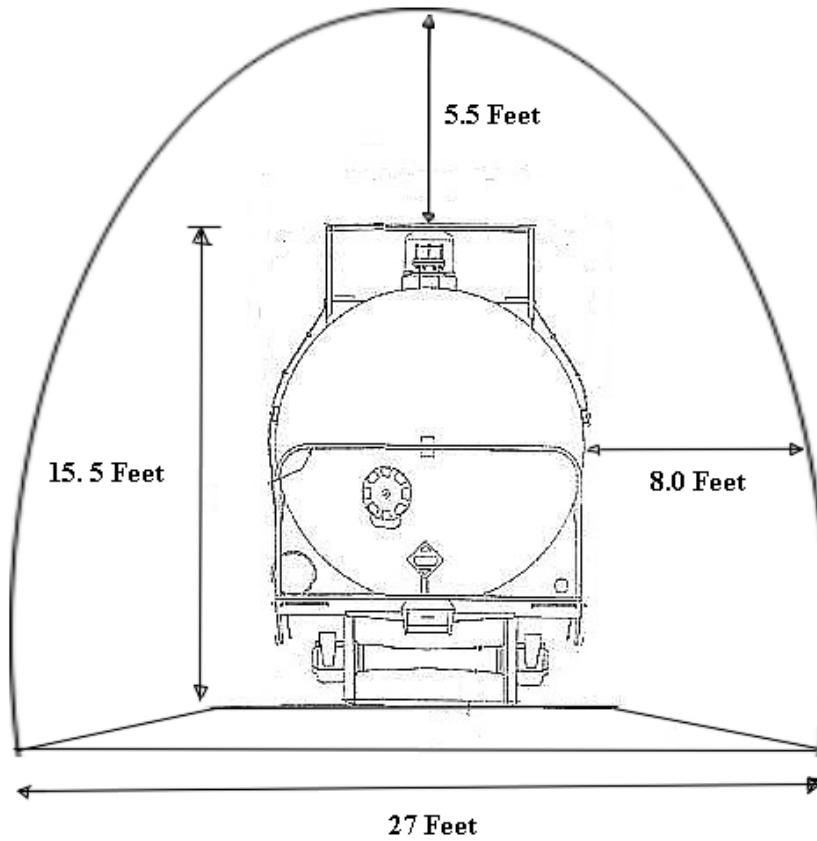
Dimensions of Howard Street Tunnel with Tank Car on Track
